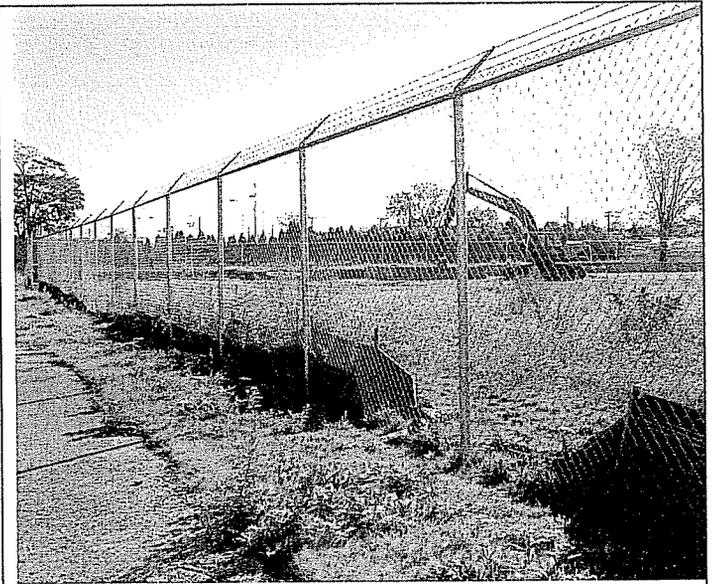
Singer Substation, view of site from northwest corner, silt fence in need of repair.
